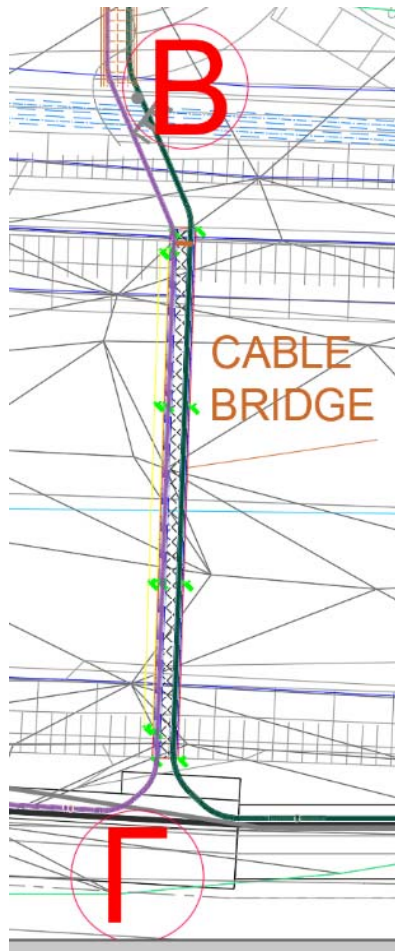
Cable systems on board the existing metal cable/pipe bridge.
